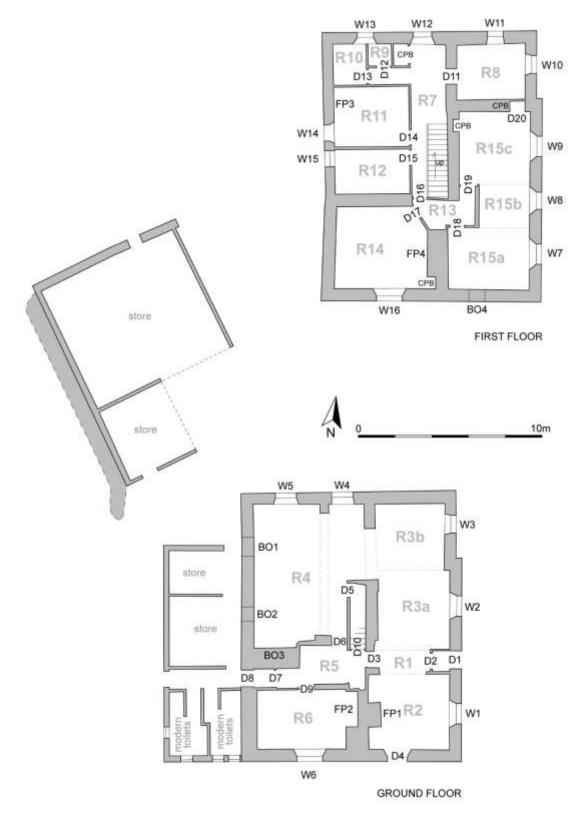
LABELLED FLOOR PLANS (BASED ON SUPPLIED PLANS).
